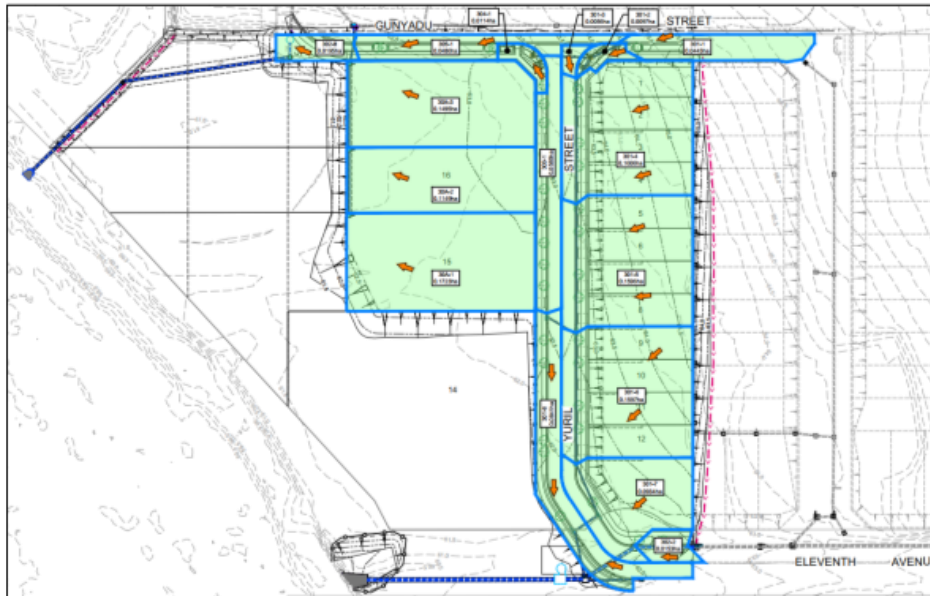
Proposed Catchment Plan (Source: Colliers, October 2024)
